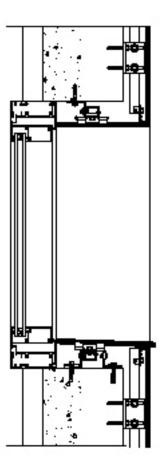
VIEW OF OPENING HORIZONTAL SECTION
